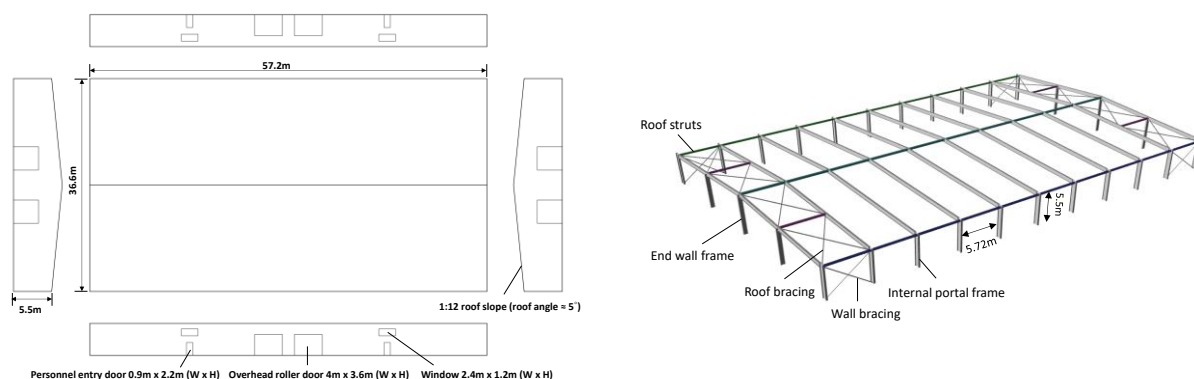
Plan view, Steel frame and bracing of the prototype industrial building.
